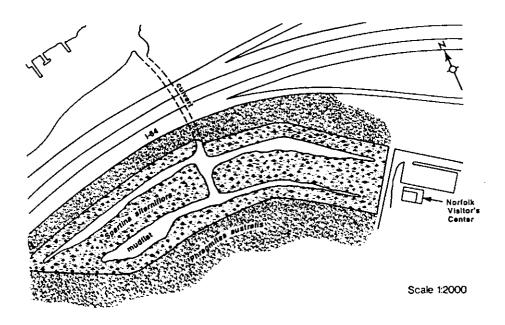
Monkey Bottom plan view with planting area and creek placement. Creeks were placed to provide complete drainage of the created marsh. Planting area was all low marsh and only smooth cordgrass (Spartina alterniflora) was planted.
